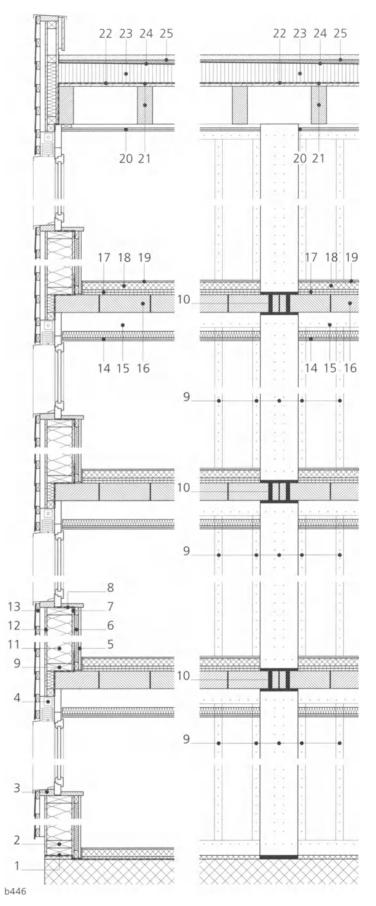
and b447 show two typical sections through multistorey buildings. Figs. b446 and b445 make use of the construction principle according to example 2 in Fig. b425. Figs. b447 and b448 adhere to the construction principle of example 3 in Fig. b425. In both of these buildings, the loadbearing structure of the stair shaft (in reinforced concrete) is independent of the other parts of the building.
